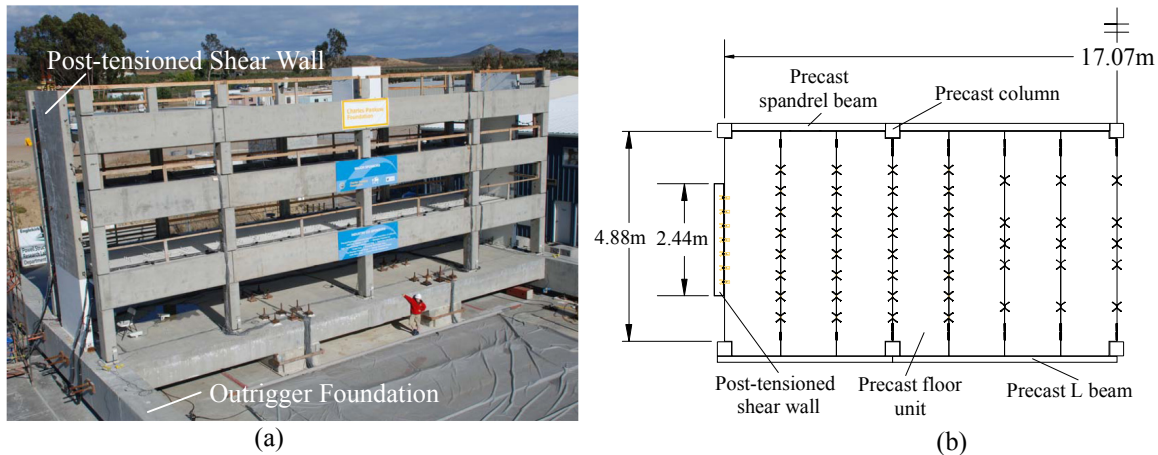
Shake table testing specimen (modified from Schoettler et al. 2009): (a) Specimen photo; (b) Plan of 3rd floor
